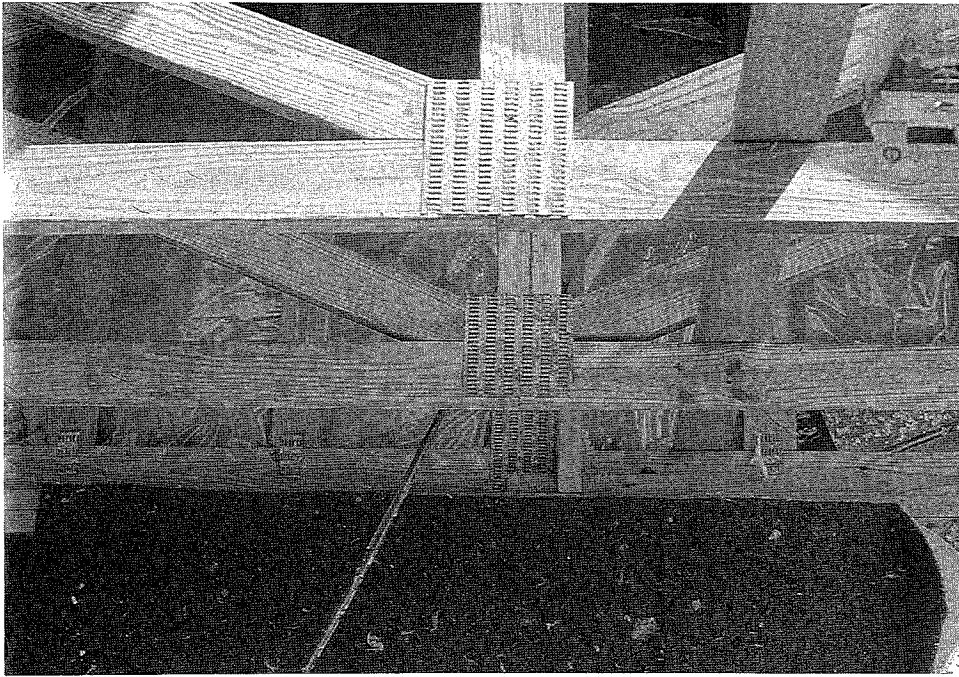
Misplaced (or undersized) steel connection plates on wood trusses.
